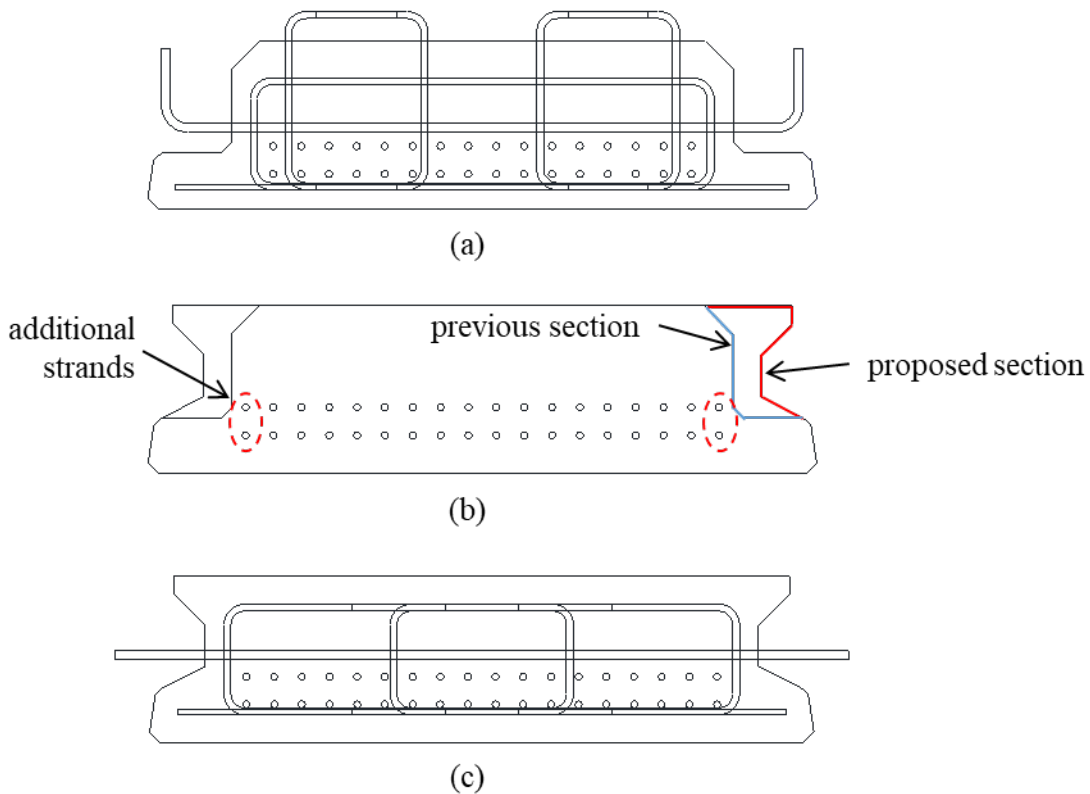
(a) Current 12-inch-deep FSB section, (b) proposed modification overlaid on original section, and (c) proposed new 12-inch-deep section with single layer of joint reinforcement
